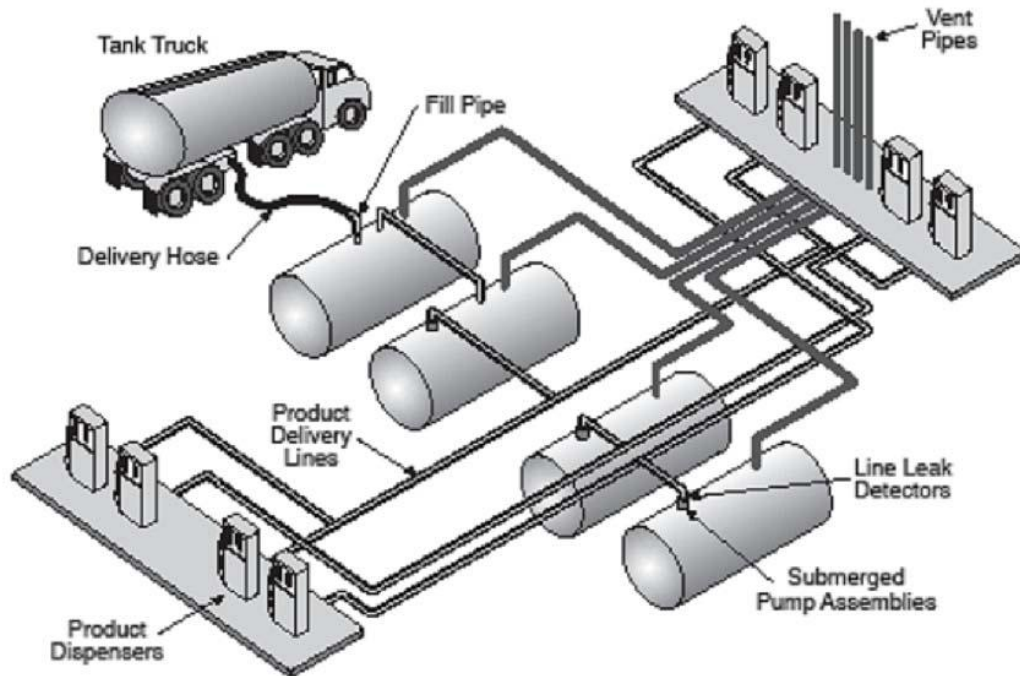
A Typical Retail Service Station with Pressurized Piping System
